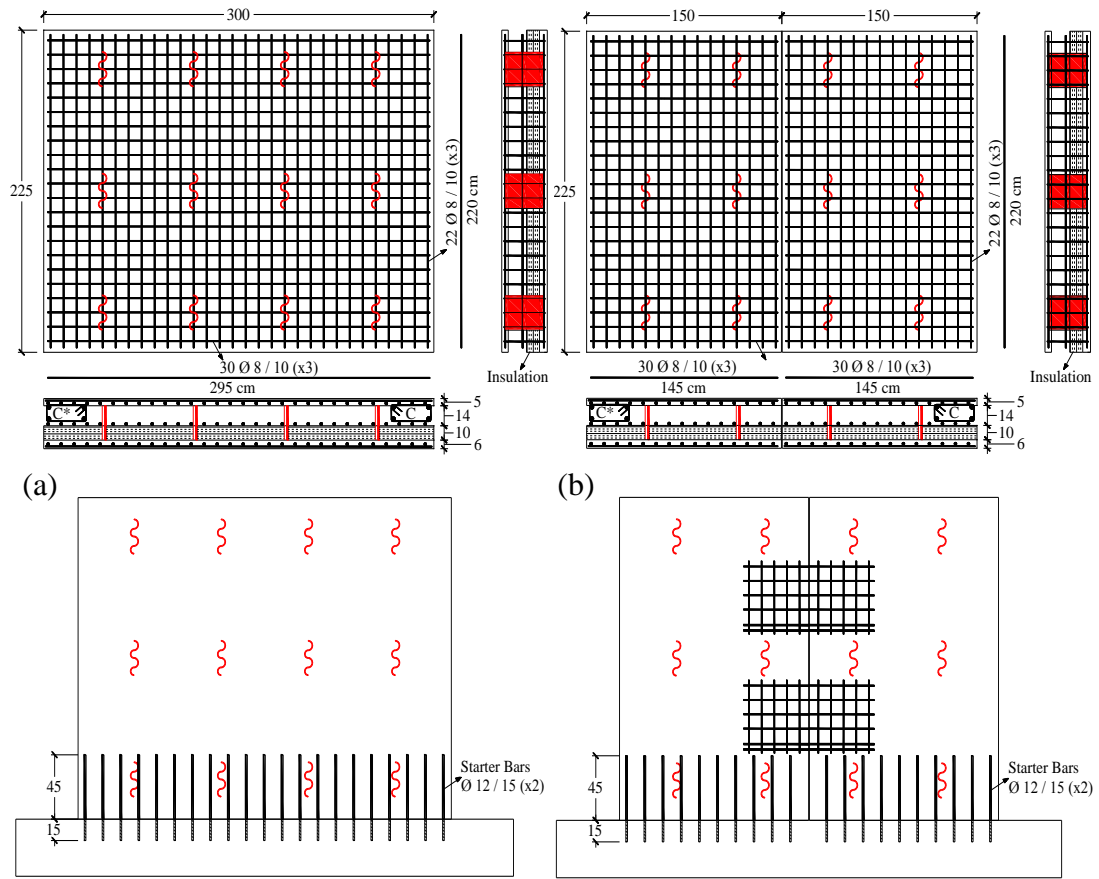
Details of: (a) Specimen 1, (b) Specimen 2 (Binici and Canbay, 2014)
